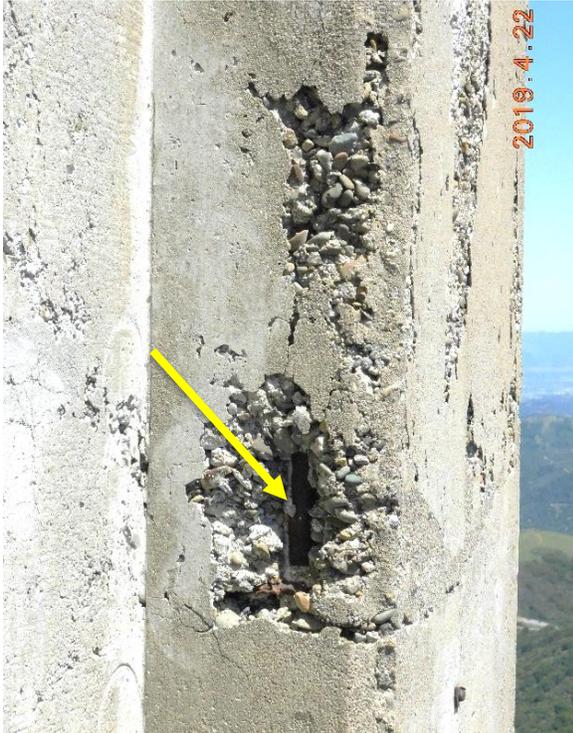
Poorly consolidated concrete on the side and corner of the pilaster. Note exposure of reinforcement steel (arrow).
